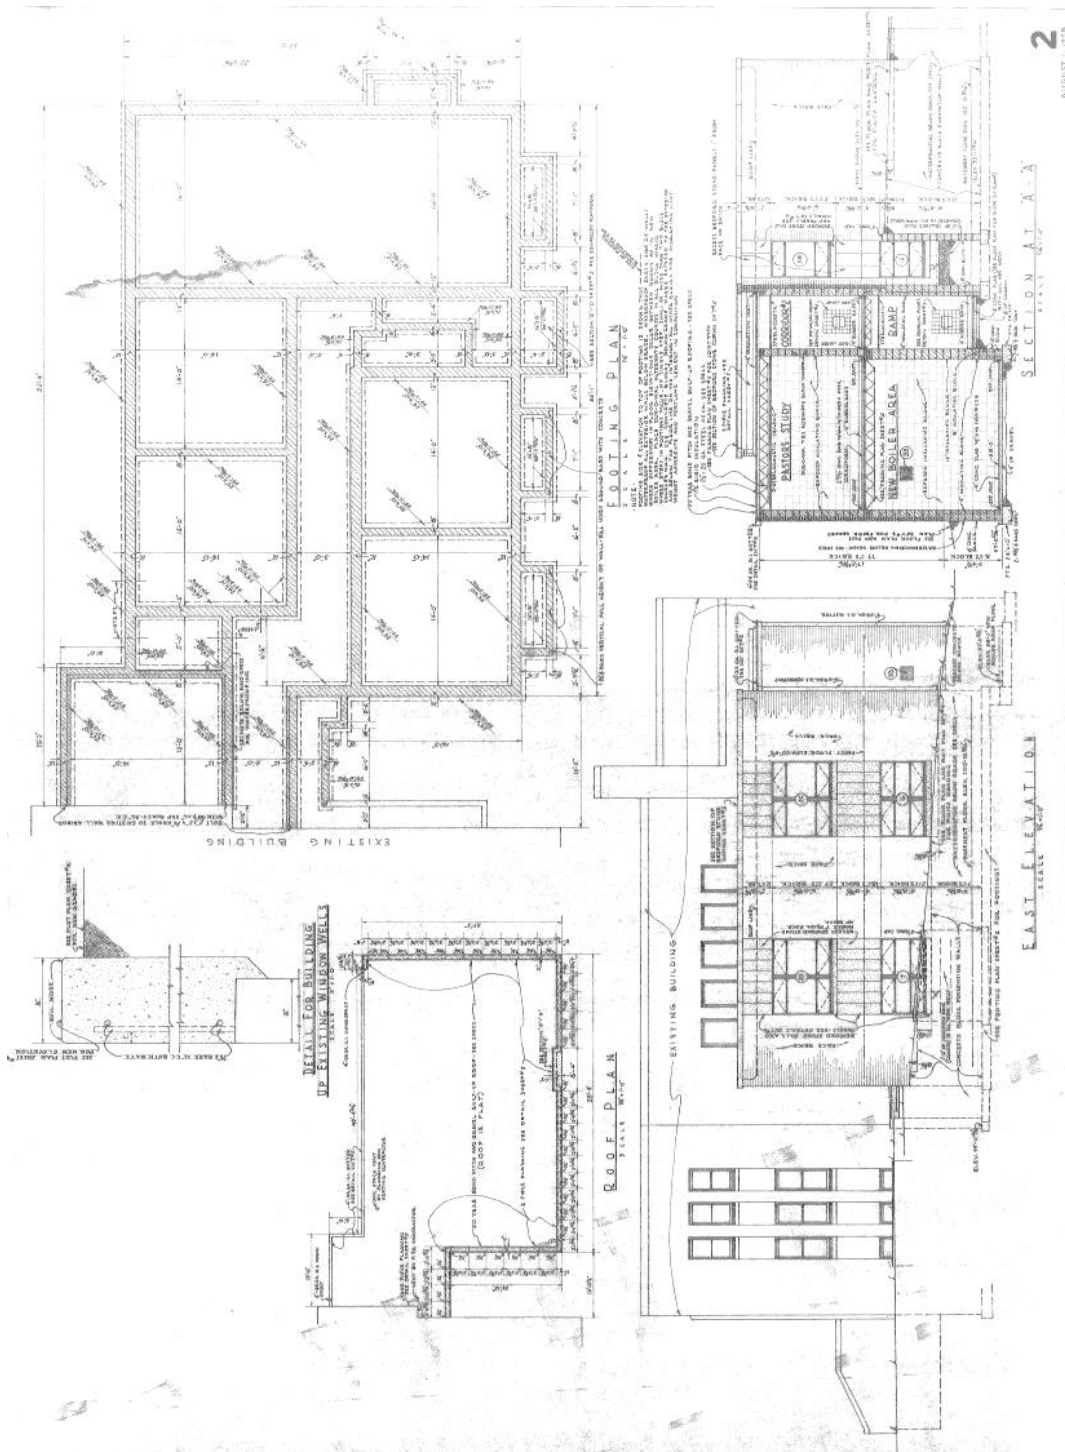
East elevation of education wing shown with east elevation of church from plans drawn by Toenjes & Stenson.
